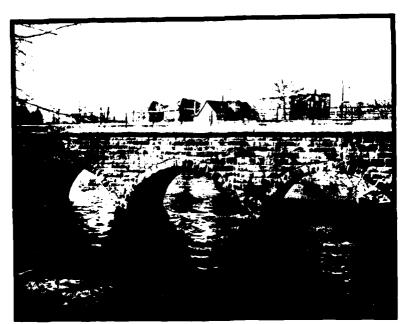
Upstream face of the Penn Central Transportation Company bridge, stream mile 47.35. (Note skew of bridge)
